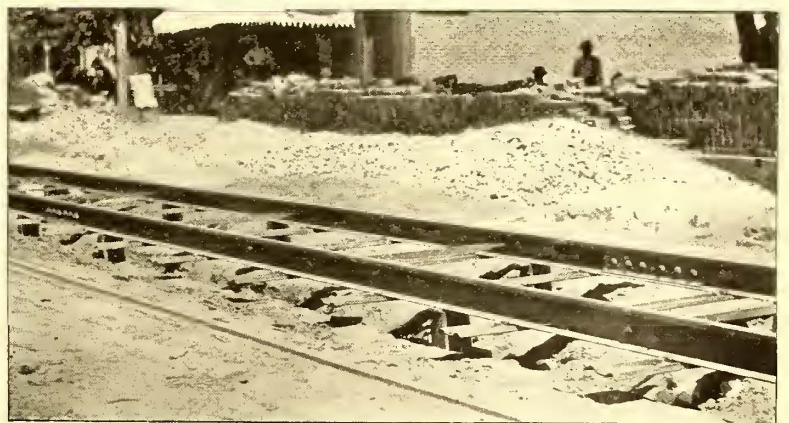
DETAILS OF TRACK CONSTRUCTION IN ASPHALT PAVED STREETS
